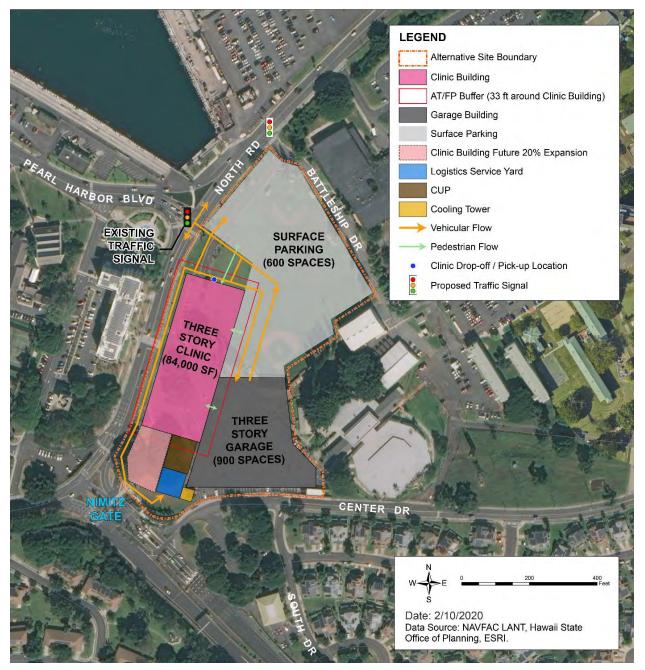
Proposed Conceptual Site Plan of the Bloch Arena Site
